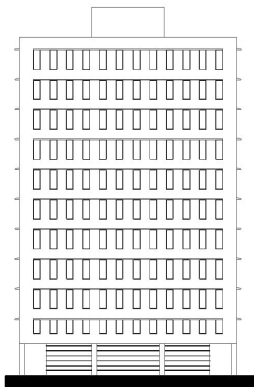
Main façade for building Pedro de Valdivia. Santiago. Chile.
